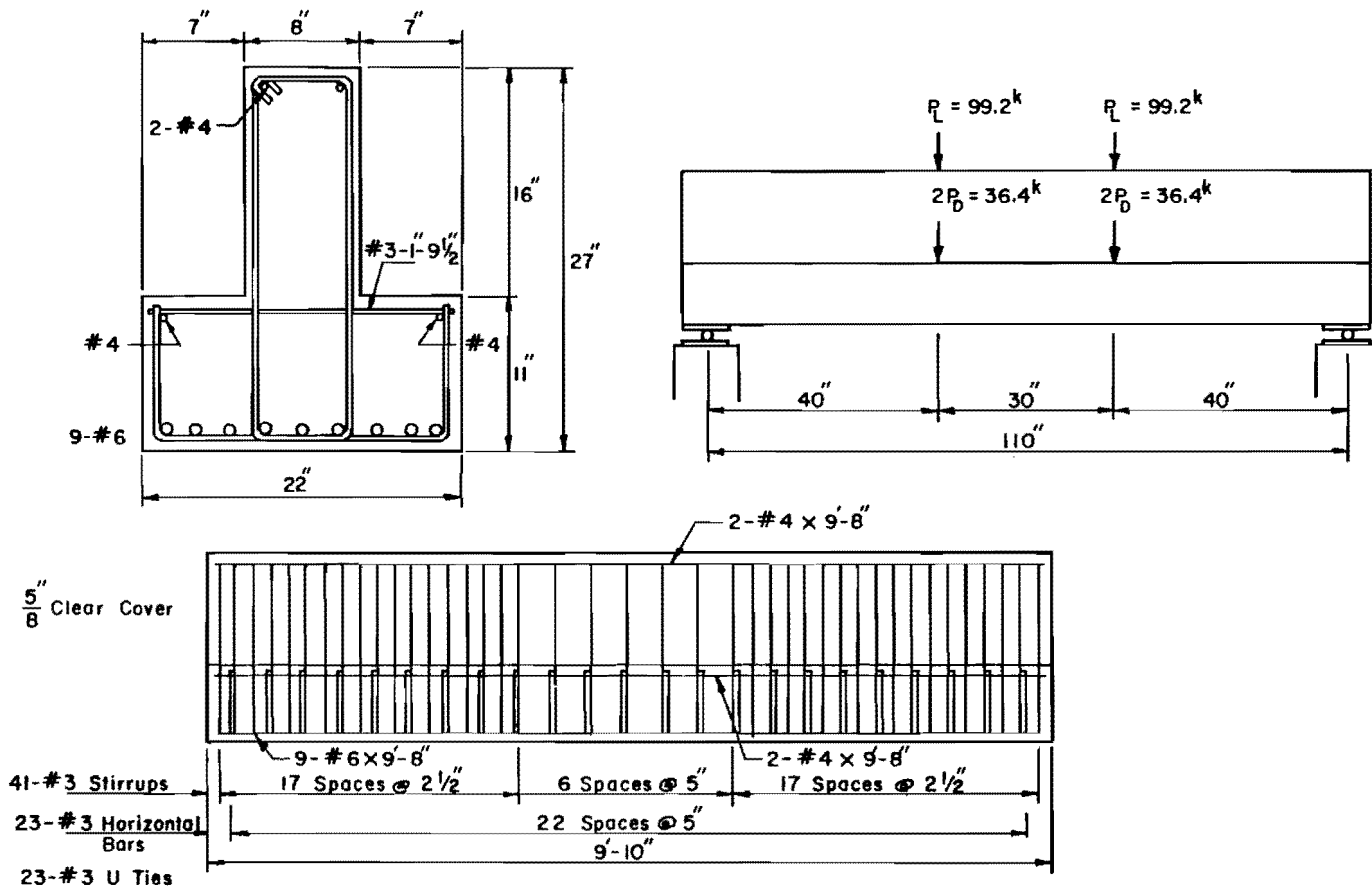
Dimensions, reinforcement, and predicted maximum loads for Beams BMS2 and BMSP2
